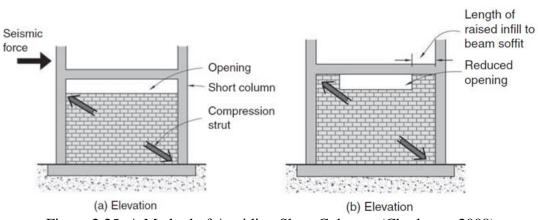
A Method of Avoiding Short Columns (Charleson, 2008)
